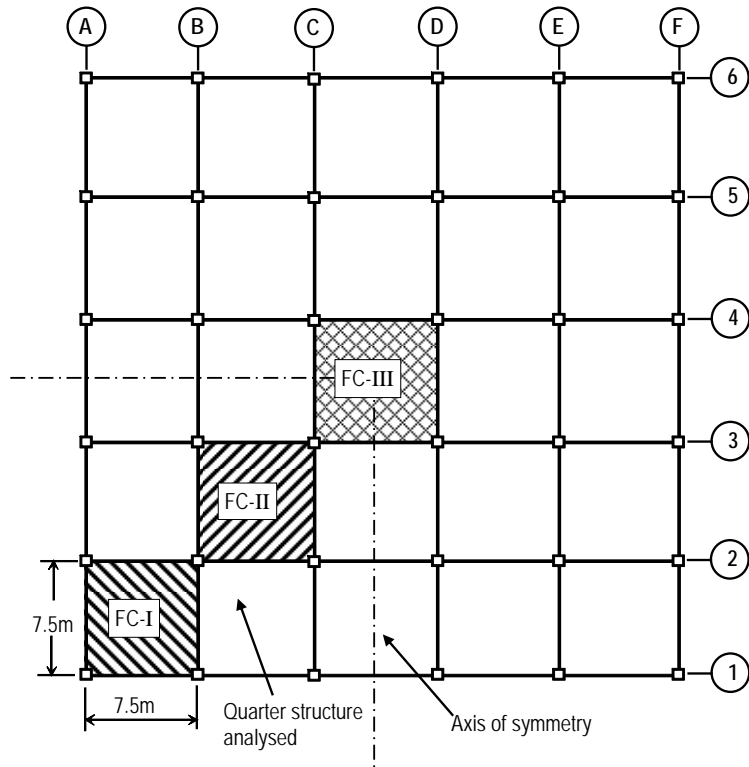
Concrete structure layout, with different fire compartment positions marked.
